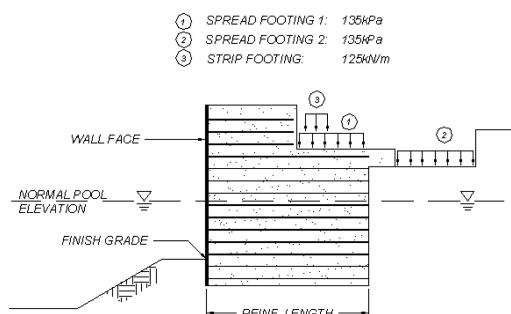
Cross section showing the loading conditions with building loads and normal pool elevation.
